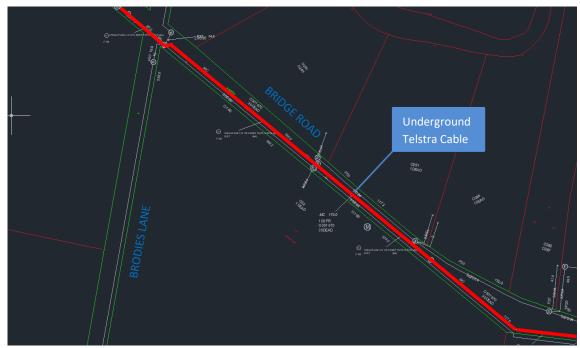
TELSTRA LAYOUT ALONG BRIDGE ROAD
